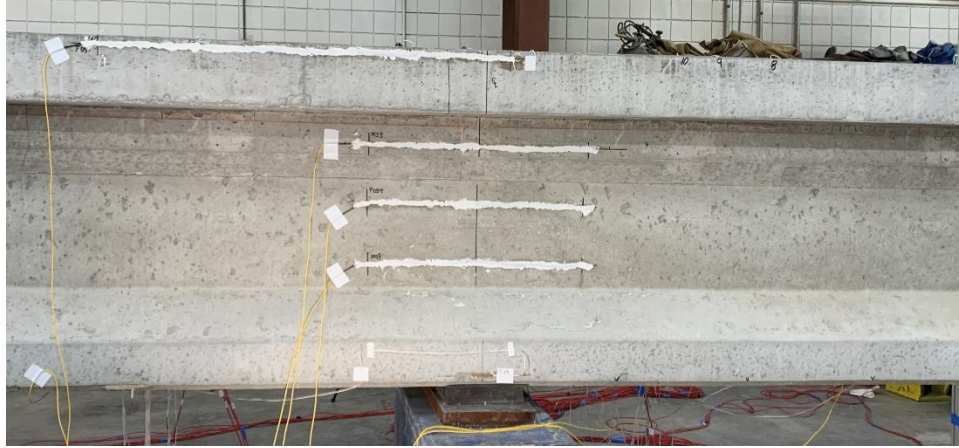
Typical fiber optic sensors installed on NB precast specimens
